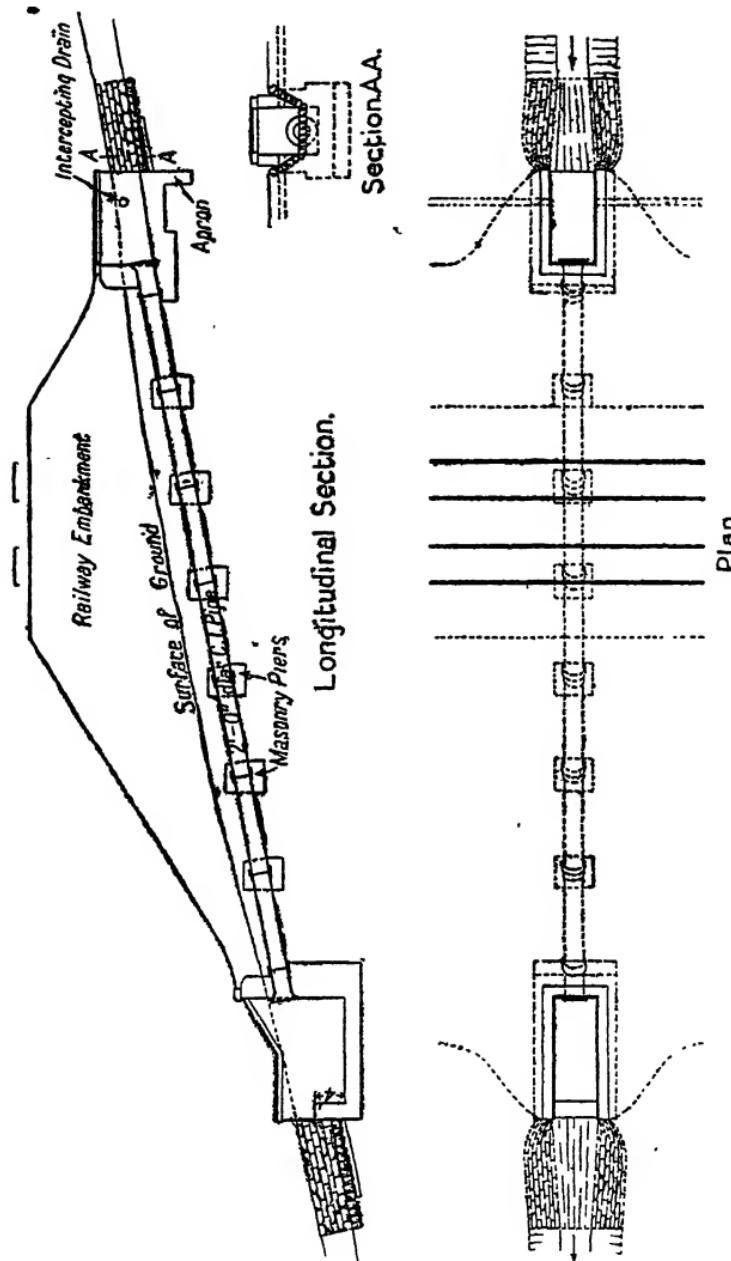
Pipe conduit under railway embankment on side-lying ground.
